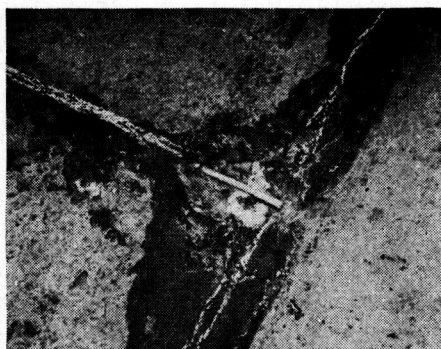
Figure B. Deterioration Around Bar Placed Within $\frac{1}{2}$ in. of Surface—Cracks Over Bonded Edge Bars Shown Next to Pavement Widening—Project 125
